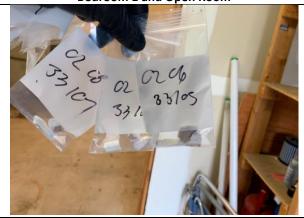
Photo of HA number 33, Sample No. 0206-33-105, 0206-33-106 & 0206-33-107 | Non-ACM White Drywall / Joint Compound (Unfinished), within Storage Room 1
